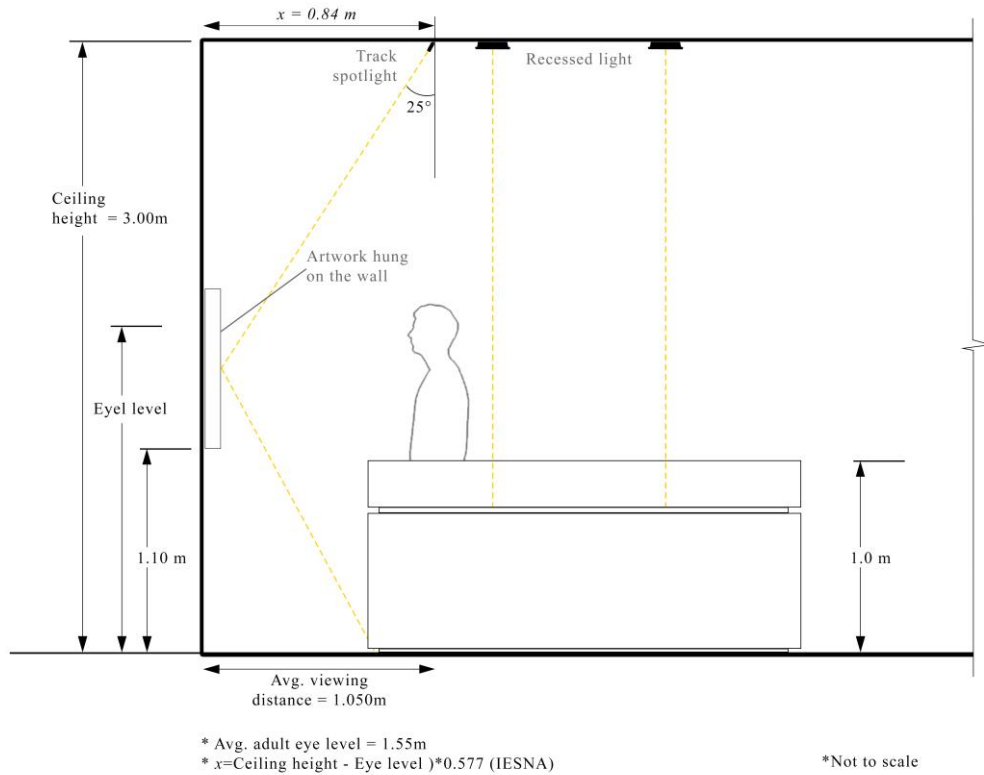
DD' Section – The mounted luminaire details in Room 3
